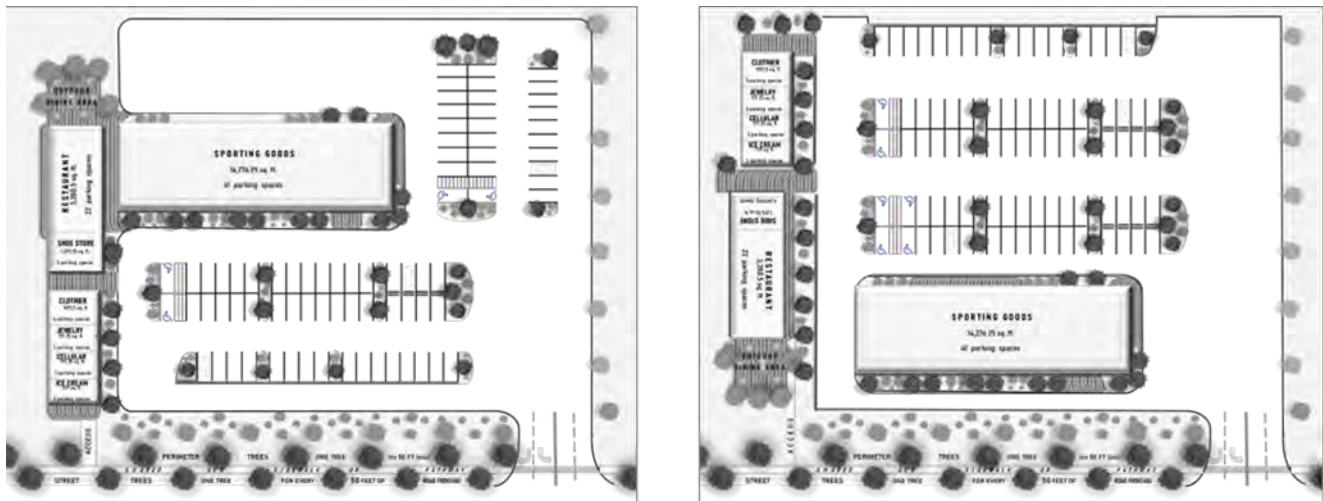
Two examples of a commercial development primary building layout / shared parking area design.
